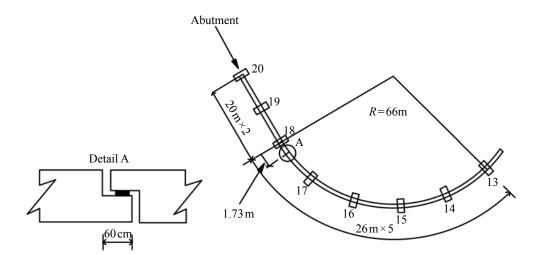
Plan view of the fifth and sixth segments of the Baihua Bridge
